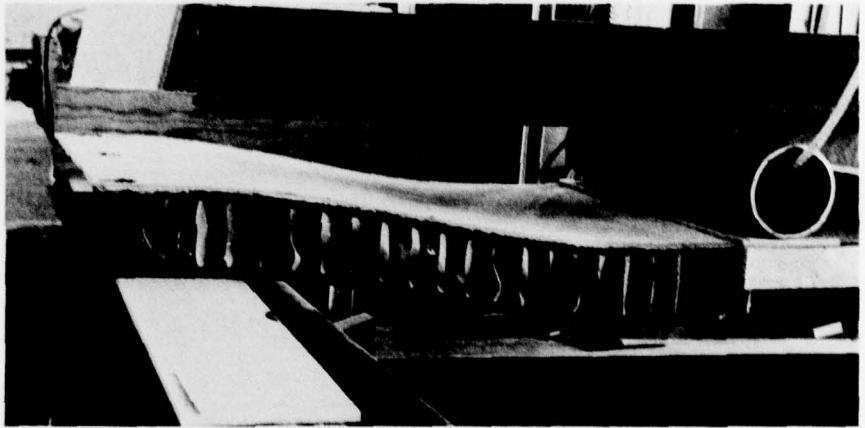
View of failure due to shear in a panel with fiberboard facings and expanded type of core (Panel No. 3S4). (M 147 139-11)
